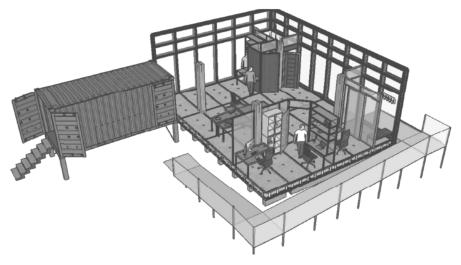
A sample eco-building Source: <u>http://unipi.ca/ (</u>2016) An important resource in this area is <u>Guide technique sur la construction modulaire en bois</u>, whose purpose is to assist engineers and architects in designing modular wood buildings.
